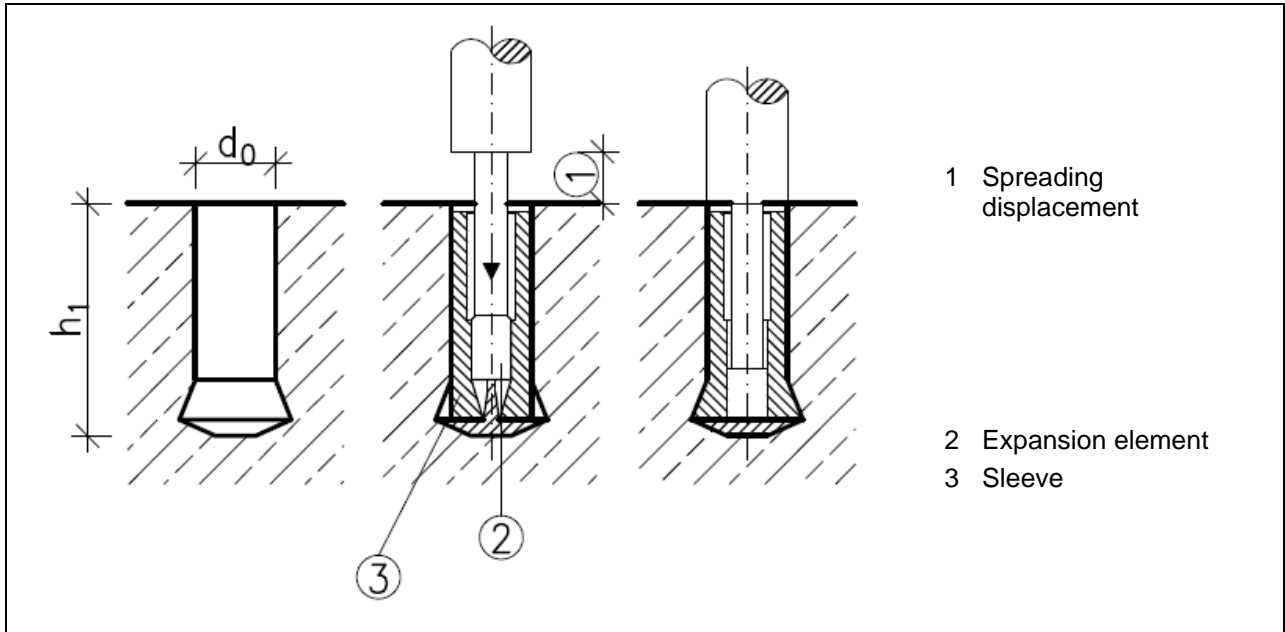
Fastener installation by hammering the expansion element (cone) into the fastener sleeve
